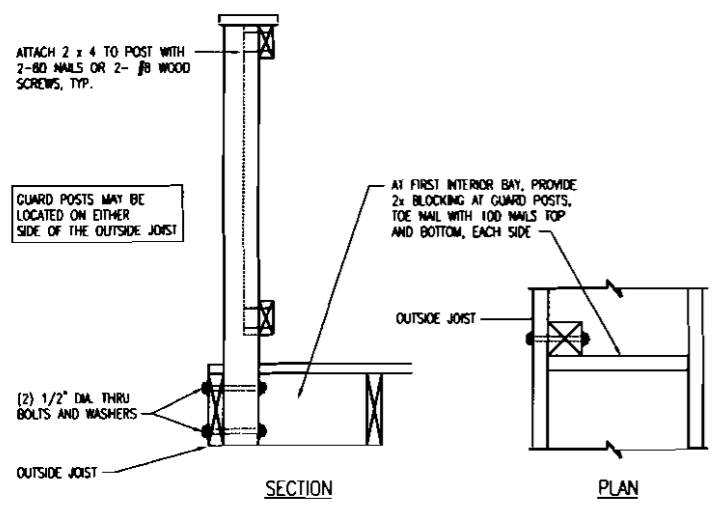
GUARD POST TO OUTSIDE JOIST DETAIL
